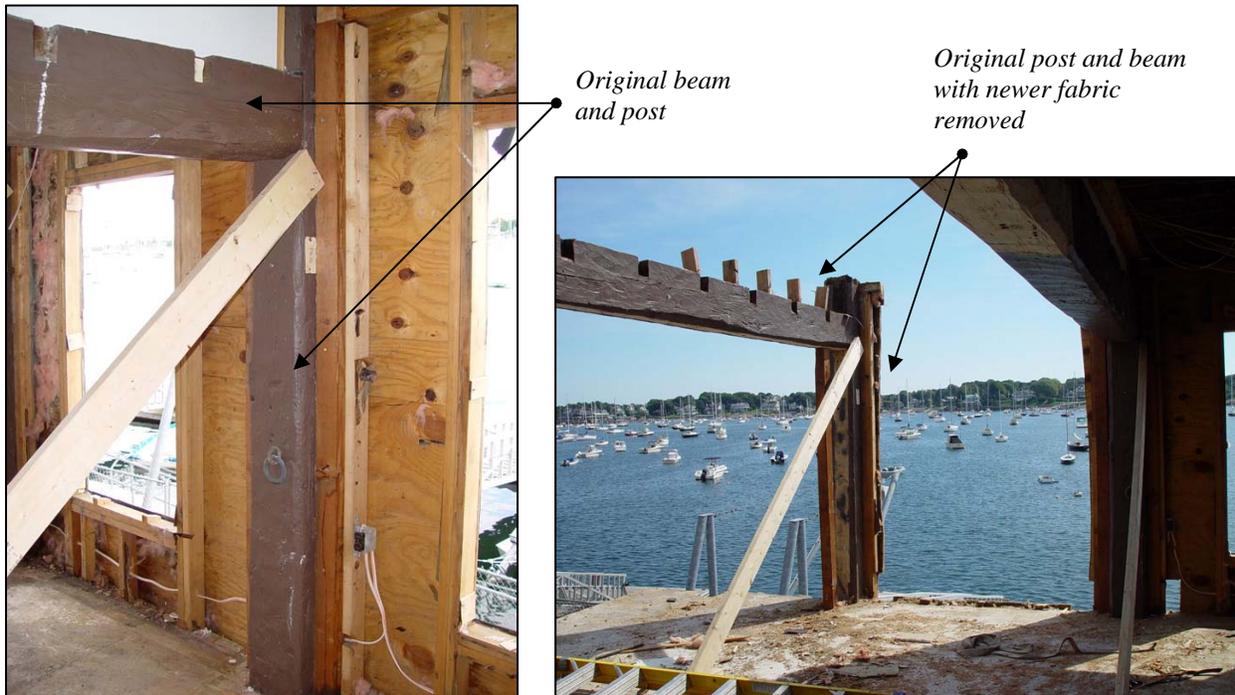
Disassembly of south elevation. Shown at left is original post and beam in place surrounded by 1973 plywood and dimensioned lumber (left). Shown at right is same area with newer fabric removed.
